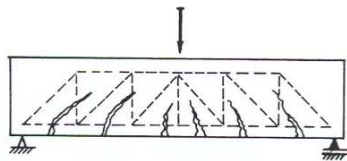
Typical shear failure in prestressed beams without web reinforcement. (Courtesy Prestressed Concrete Institute.)
